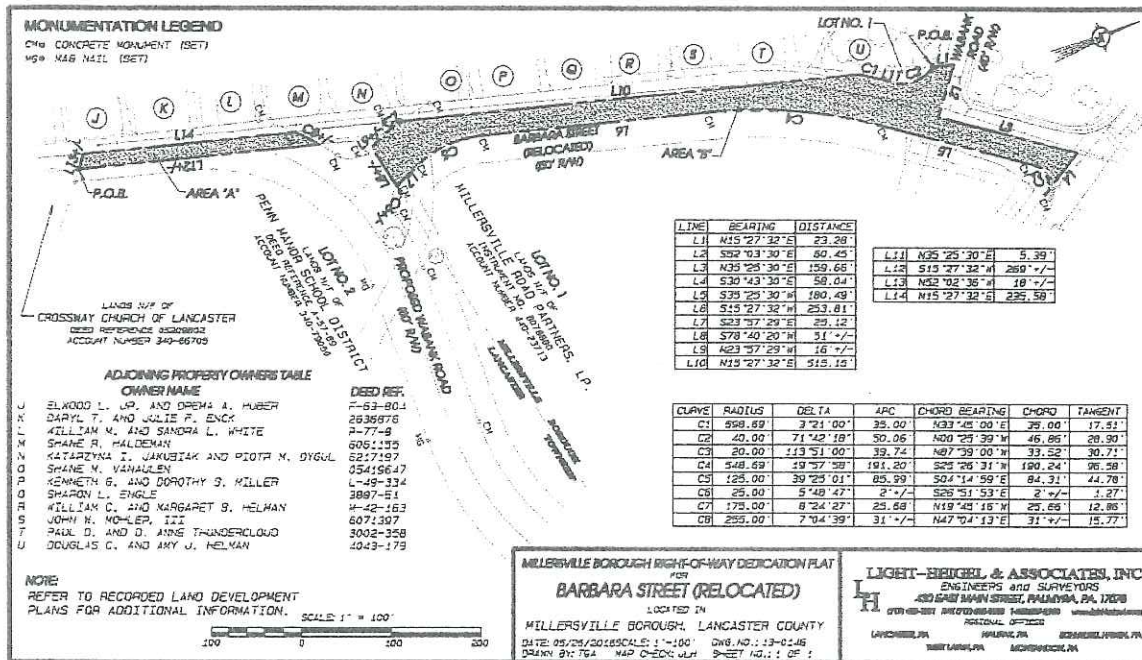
EXHIBIT I PLAN OF WABANK ROAD IN MILLERSVILLE BOROUGH
